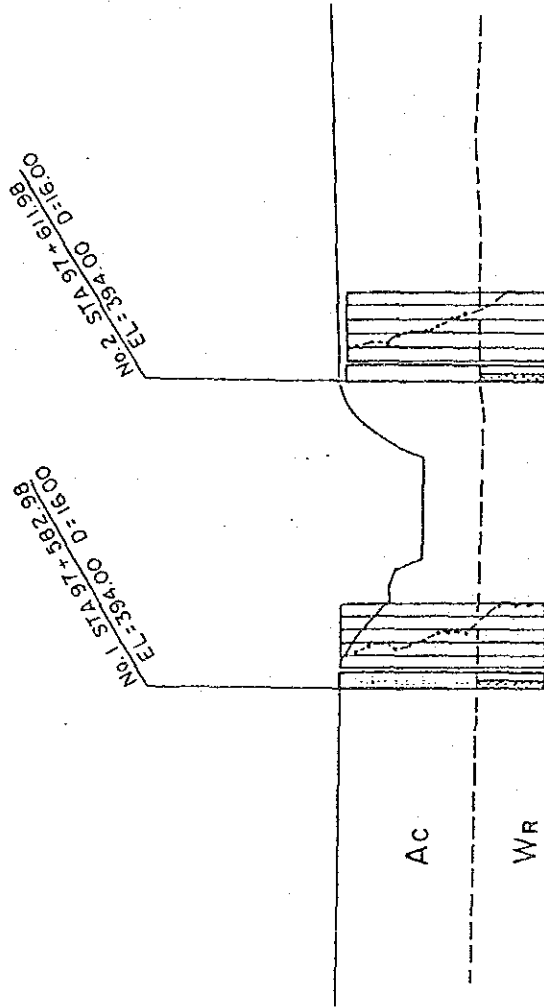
(8/10) COLUMNAR SECTION BORING LOG AND GEOLOGY
